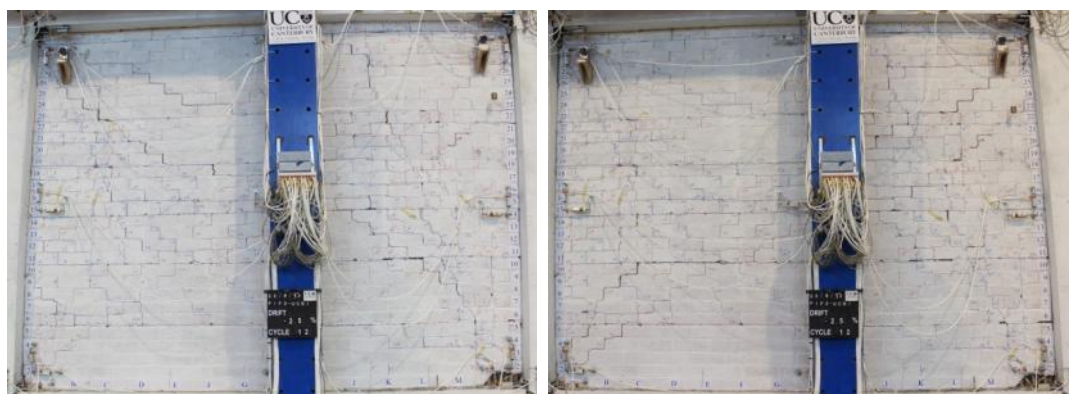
As built unreinforced clay brick infill wall specimen FIF3-UCBI: a) +1.5% drift (push), b) -1.5% drift (pull)
